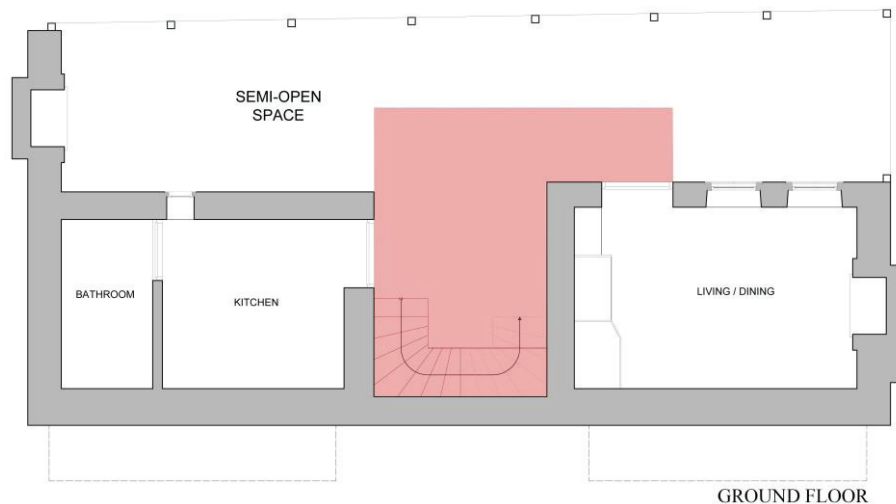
Gürsel House ground floor plan indicating glazed circulation proposal in red hatch
